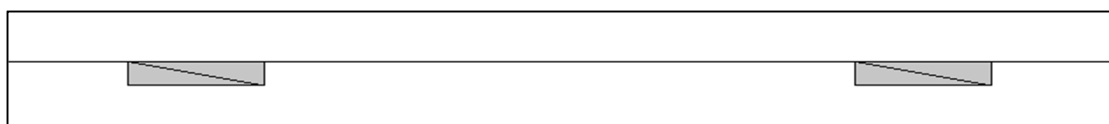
Side View (Section X-X): Road Surface with Cross-Path holes.
